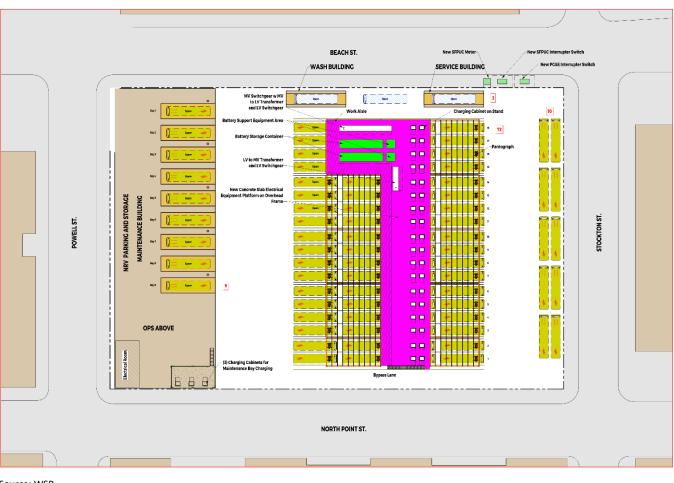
Kirkland Yard – Full ZEB Build-Out
